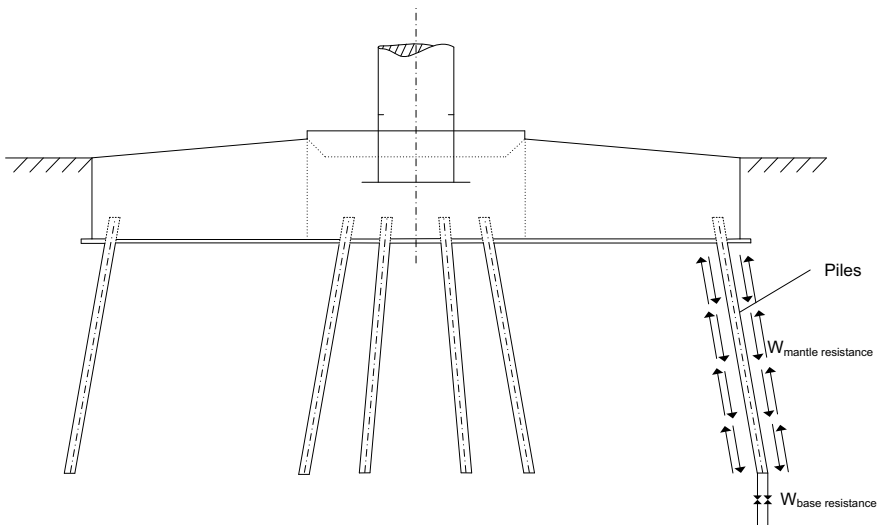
Structure of deep foundation with piles in beam cross configuration [WETI]
